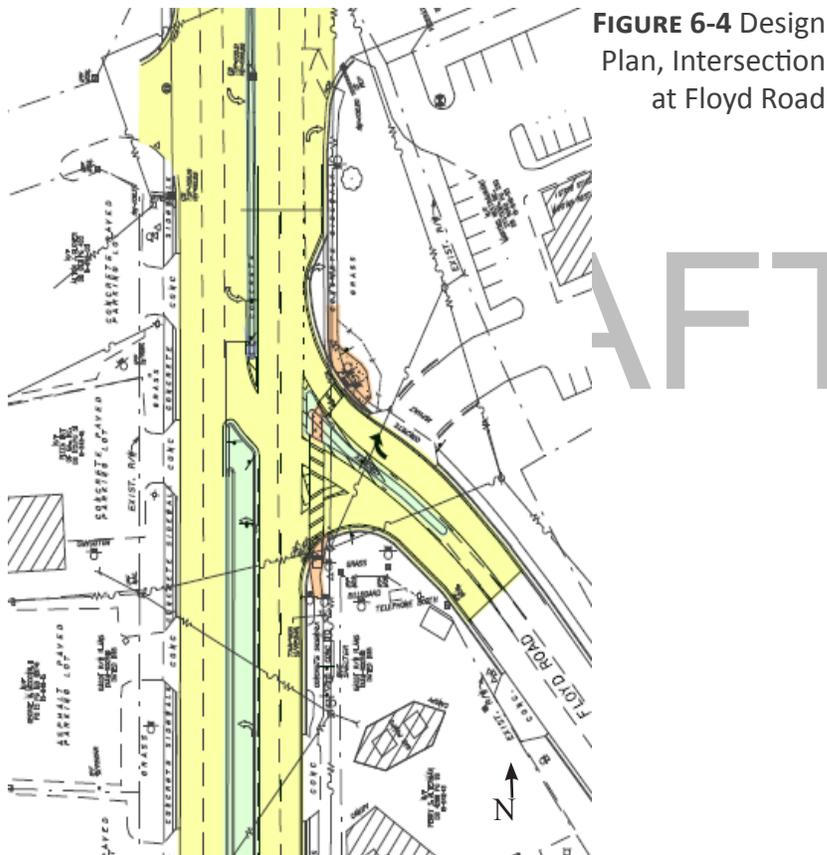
Design Plan, Intersection at Floyd Road
